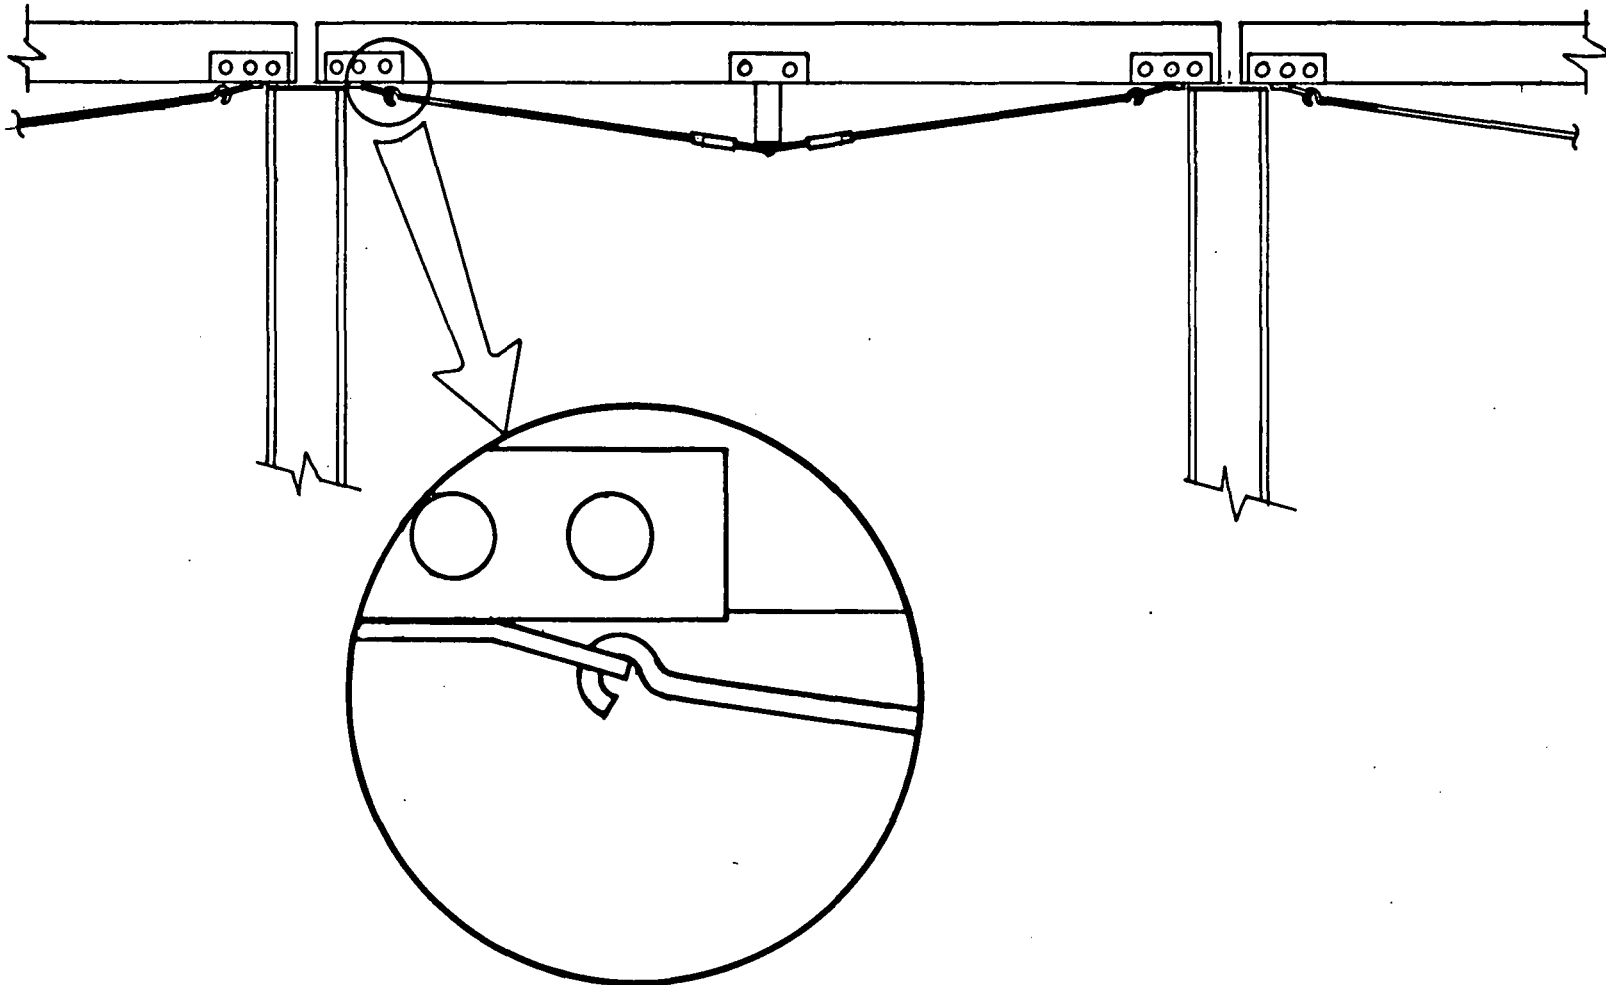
Retrofit Kingpost Concept for Wood Joists
